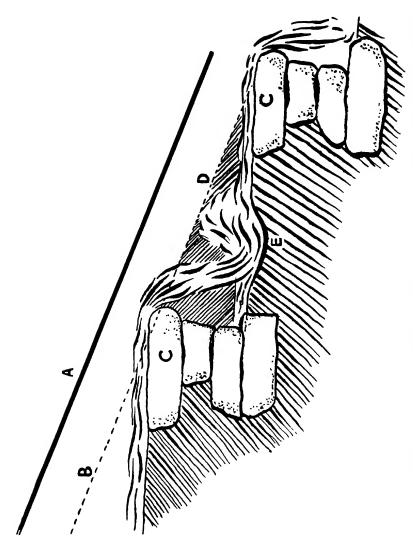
A stepped storm drain. A—Sloping ground level. B—Depth of drain. The sides are V-shaped and grassed. C—Strong stone or concrete steps on solid foundation. D—Triangles at each side of splash should have stone or grass protection. E—Falling water scours out bowl which should become static and form a water cushion. Splash stones cause turbulence and erode the banks.
